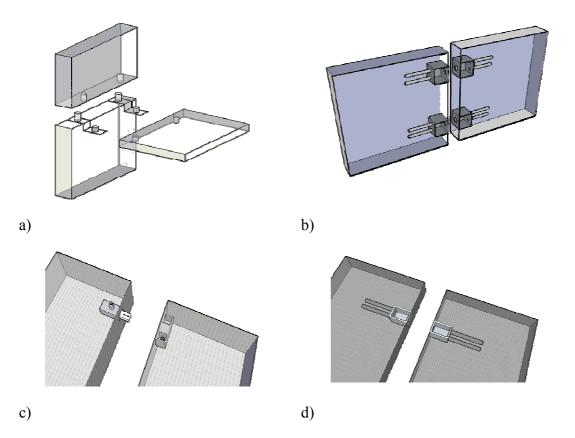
Connection concept 1 a) wall-to-floor b) wall-to-wall c) floor-to-floor d) floor-to-floor, in case of big shear forces.
